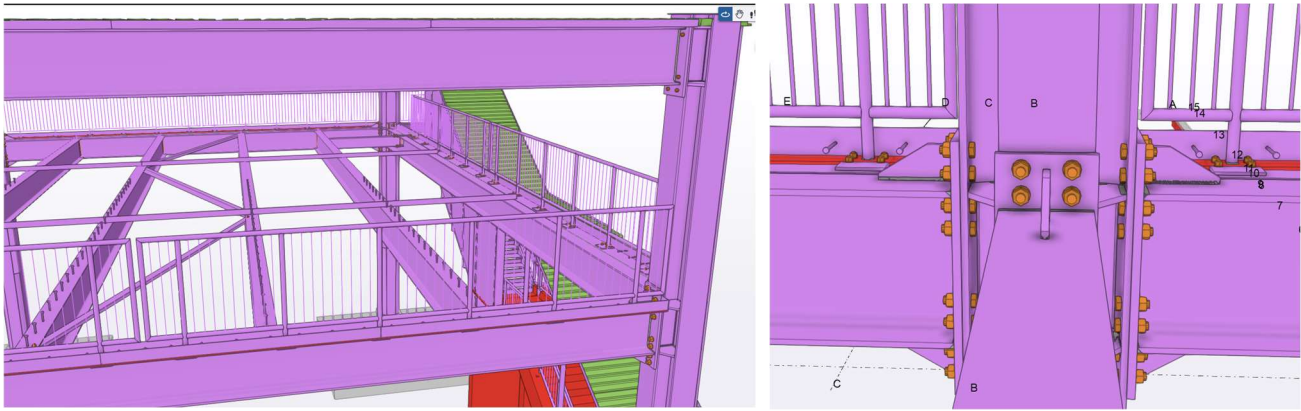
A three-dimensional model of the tsunami tower produced by the fabricator during shop drawing stage. Model view courtesy of Whistler Welding.
